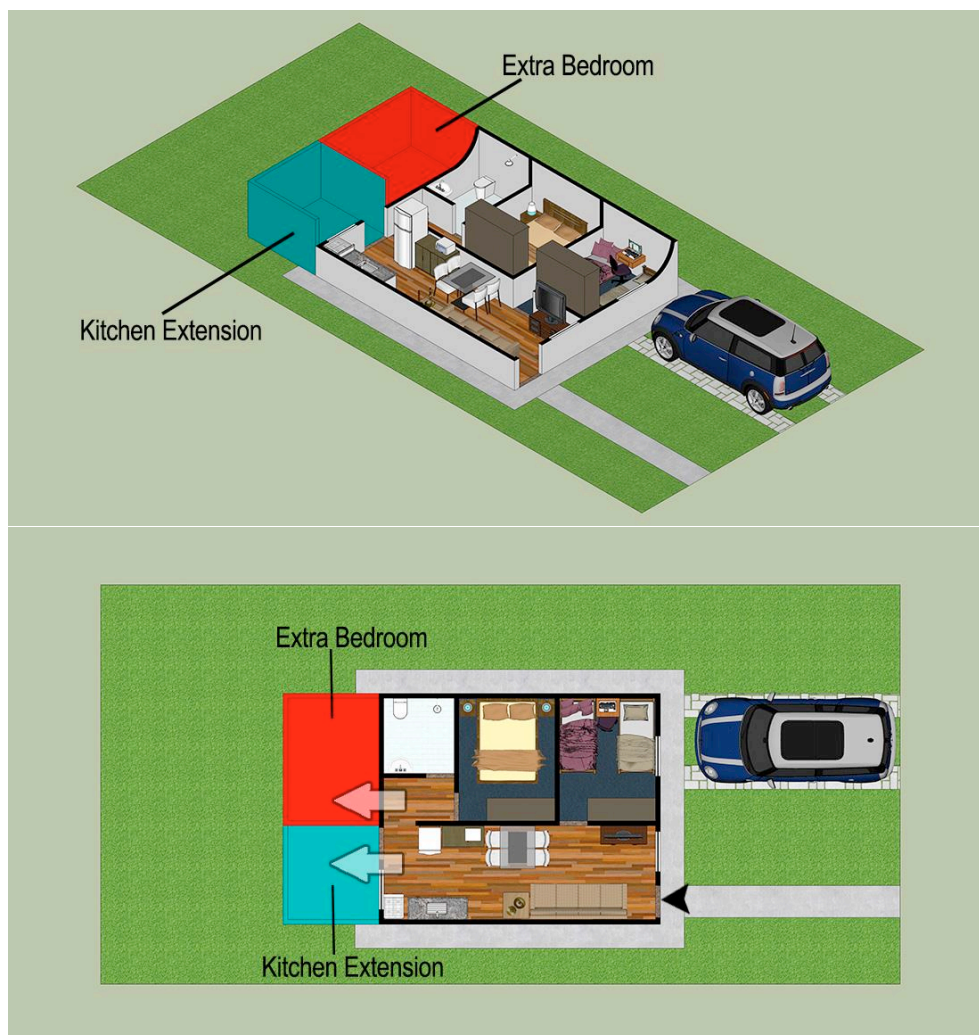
Sample model of an internal layout of a house with capability for the construction of an extra bedroom and kitchen extension.
